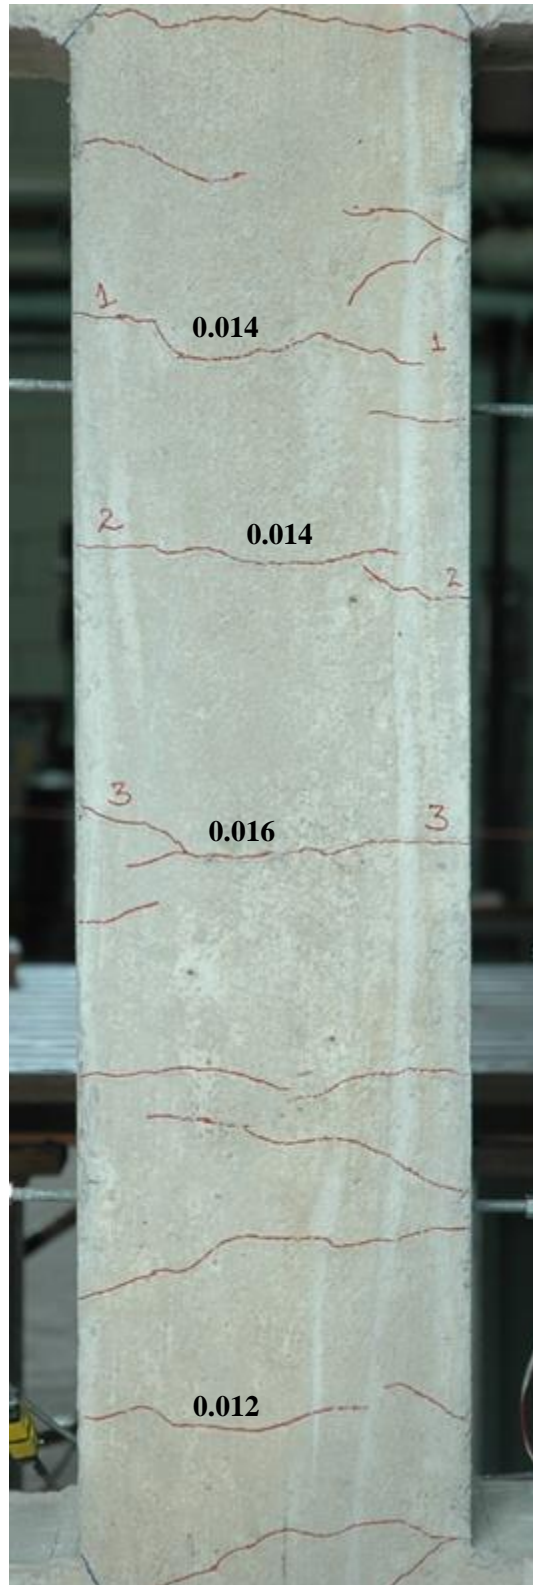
Cracks on west face of TS01 at Load Step 17
